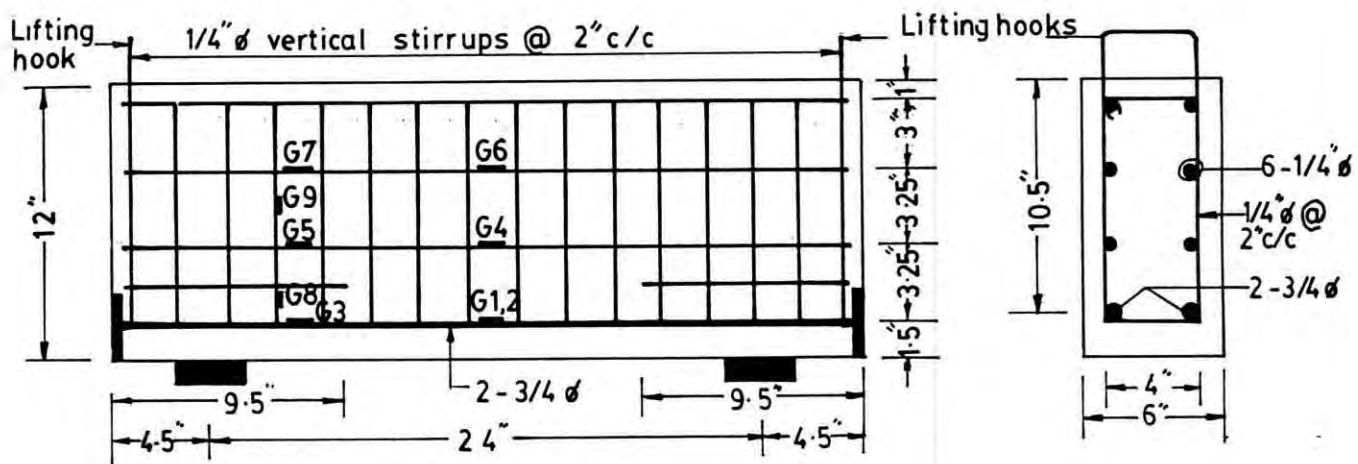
Reinforcement arrangement of beam DB-Q1
